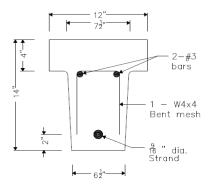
Cross-section of the beams used to evaluate development length (Trent 2007).
